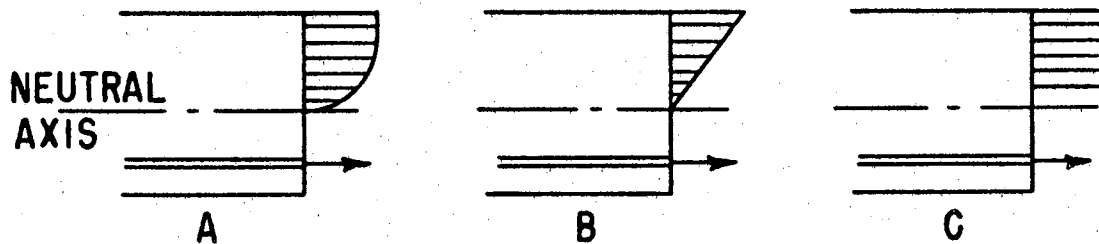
Compressive Stress Distribution in Reinforced Concrete Beams
